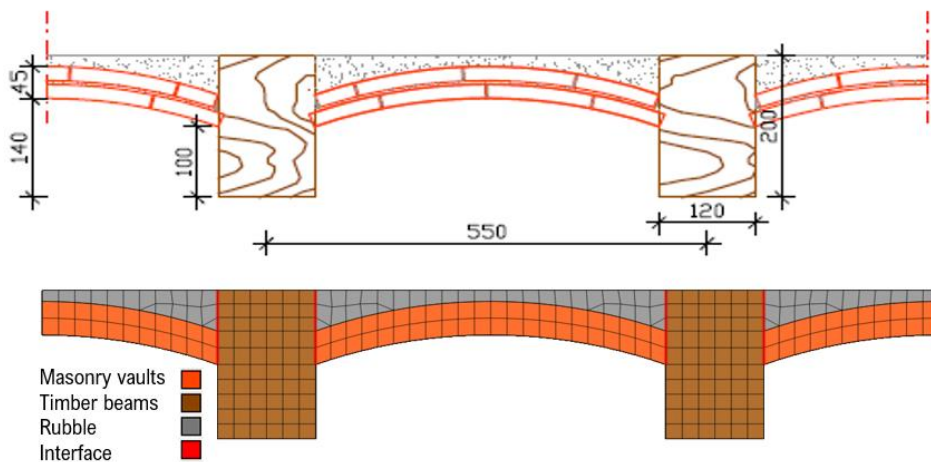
Section of the jack arch floor with timber beams and tile barrel vaults: Geometry (top) and finite element model (bottom) (dimensions in mm).
